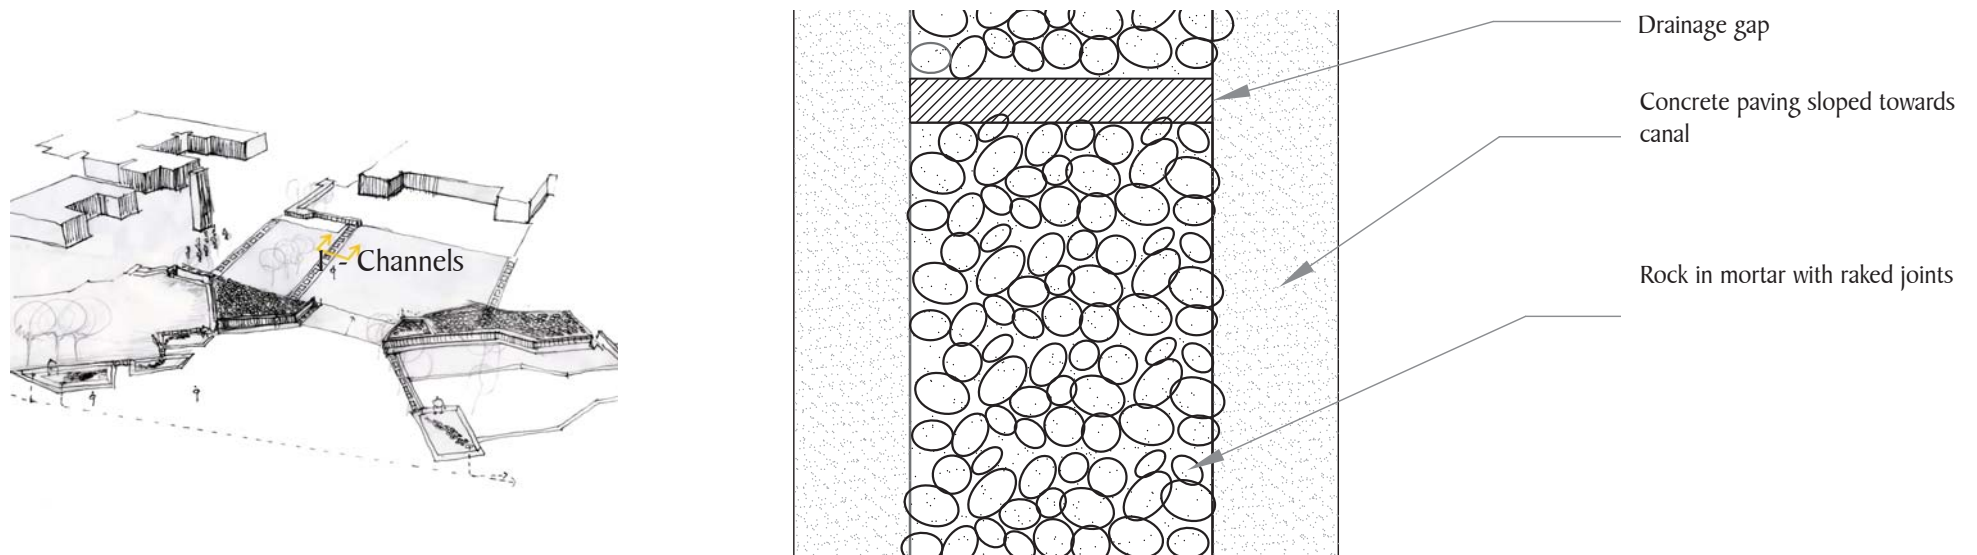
Plan of drainage channels toward stormwater feature. (Author, 2008) Scale 1: 25
